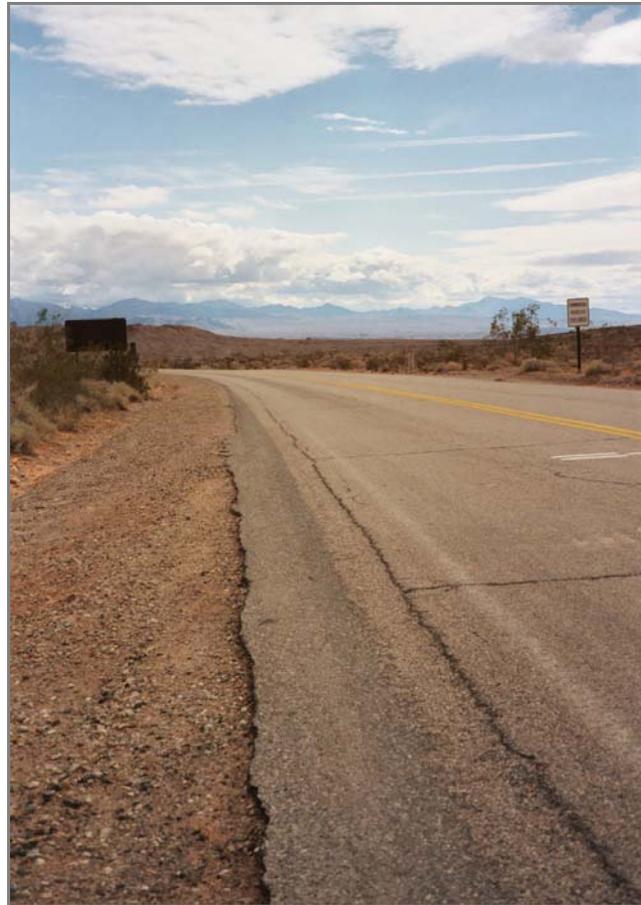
EXAMPLE OF PAVEMENT RAVELING
